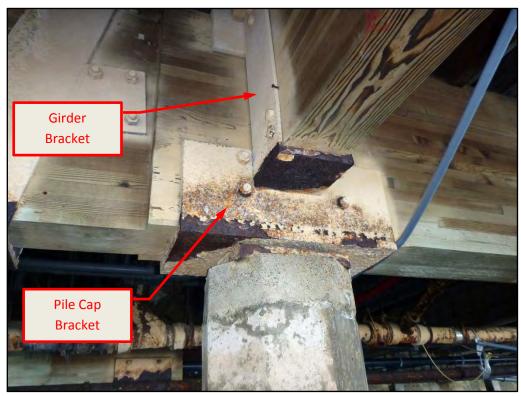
Typical condition where minor corrosion is noted on most surface areas of the steel connectors and moderate corrosion on the bottom plates (Pile 7:G).
